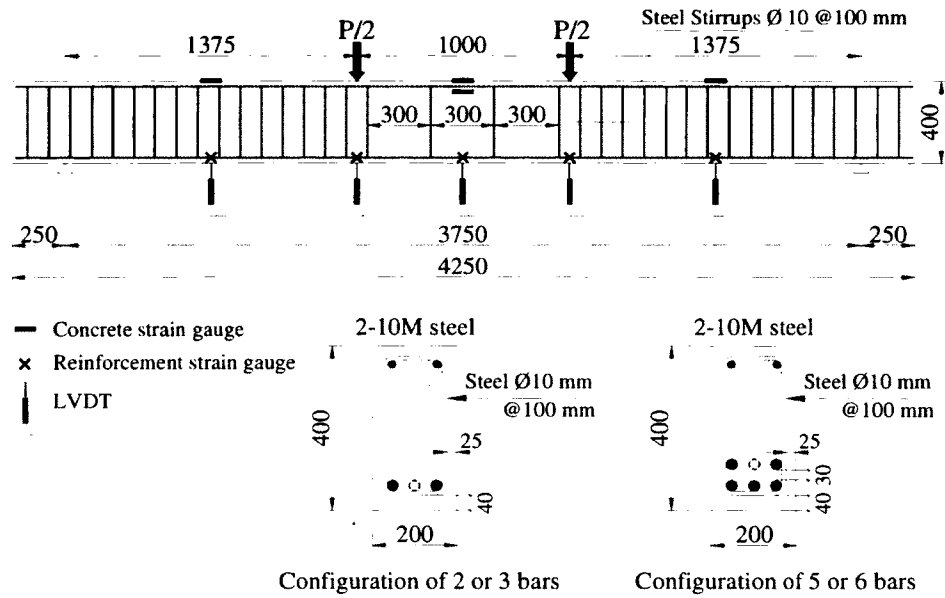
Dimensions, reinforcement details, and instrumentation
